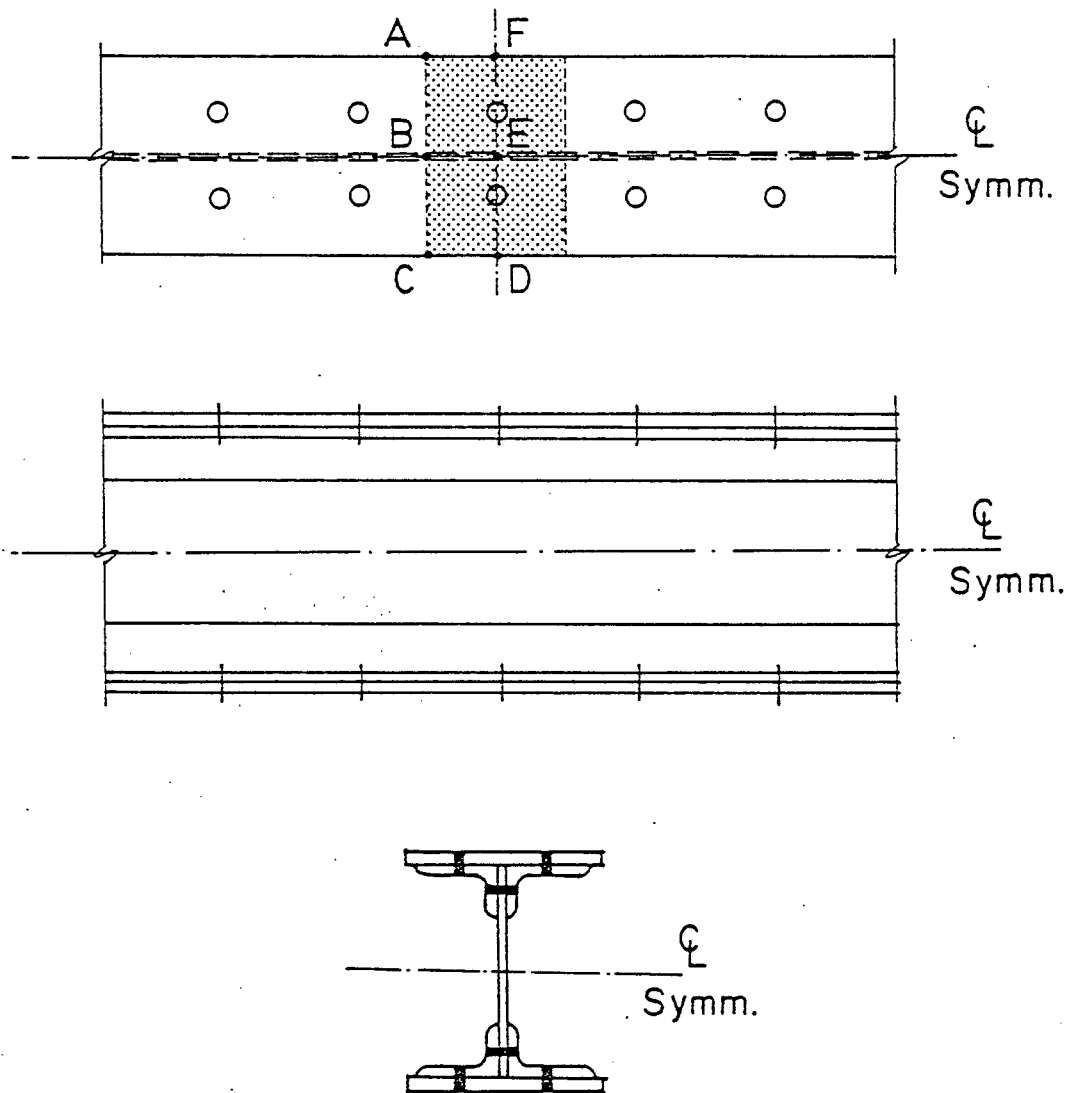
Detail of Riveted Built-up Truss Member Section
